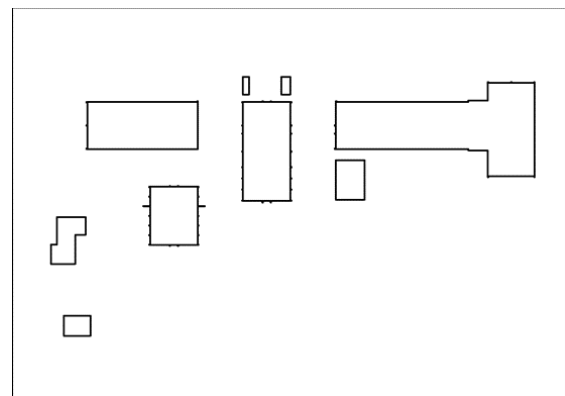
Example of a floor plan of a Brazilian Youth Prison - Form D
